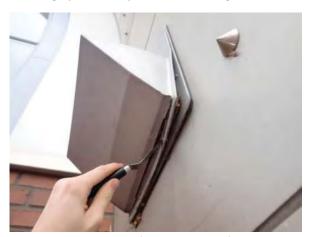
View of displaced light fixture in need of re-securement and weatherproofing retrofit attention.
